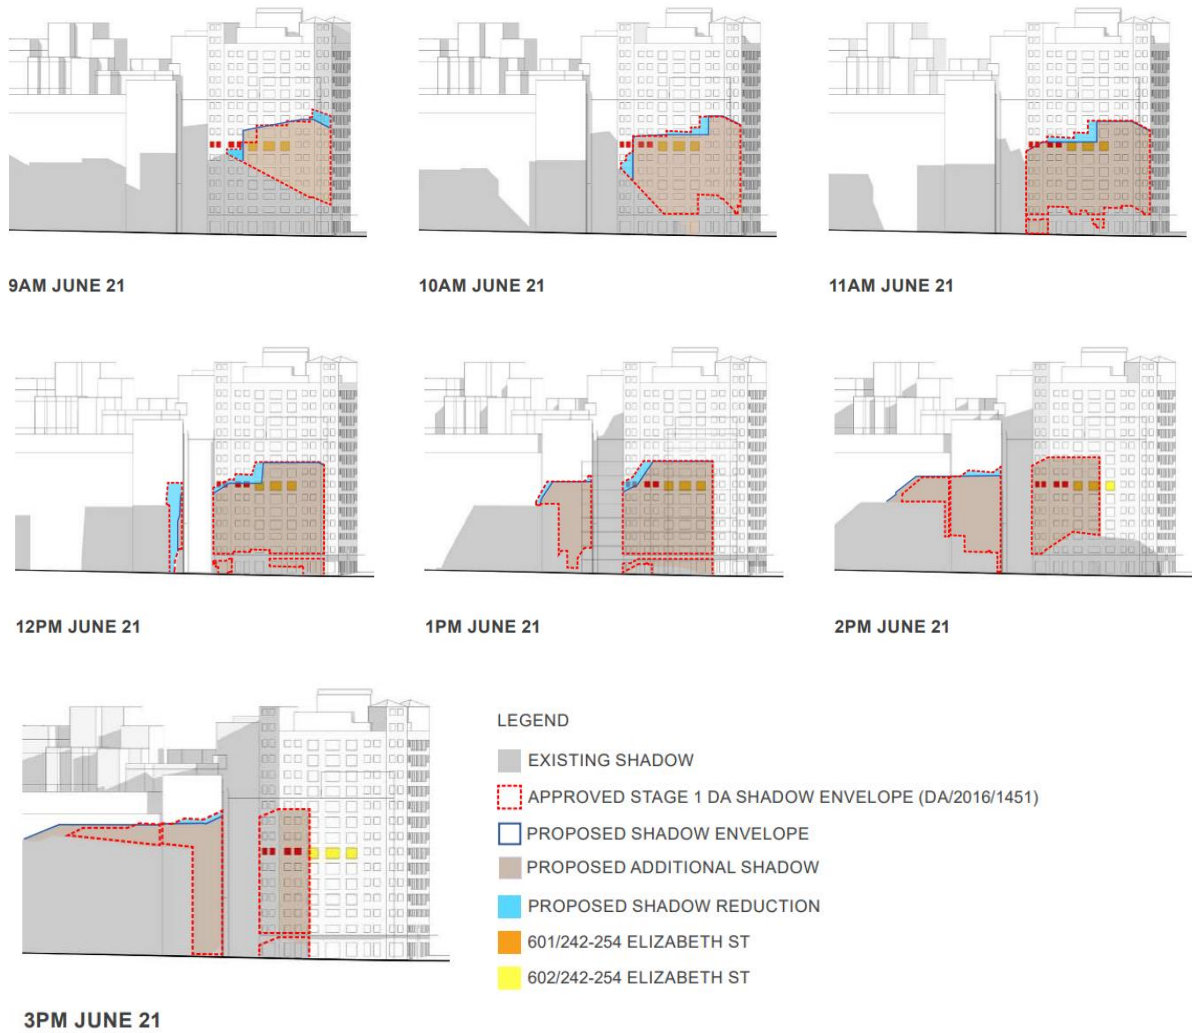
Elevational shadow diagrams showing 242-254 Elizabeth Street and 33-37 Reservoir Street
